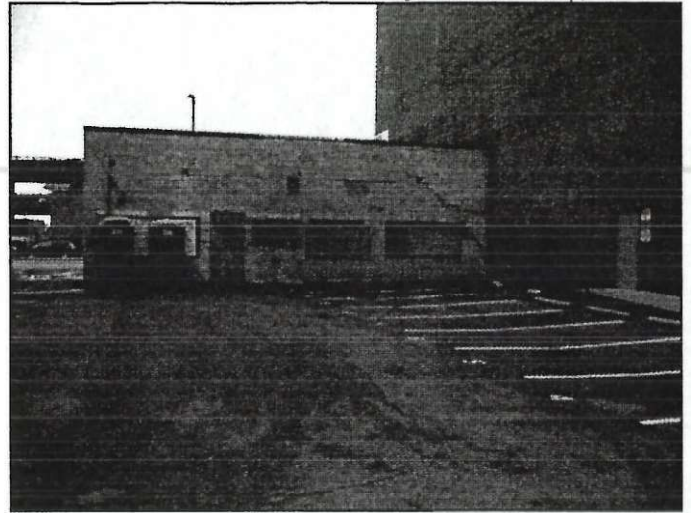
• East façade of 1006 1<sup>st</sup> Ave S
